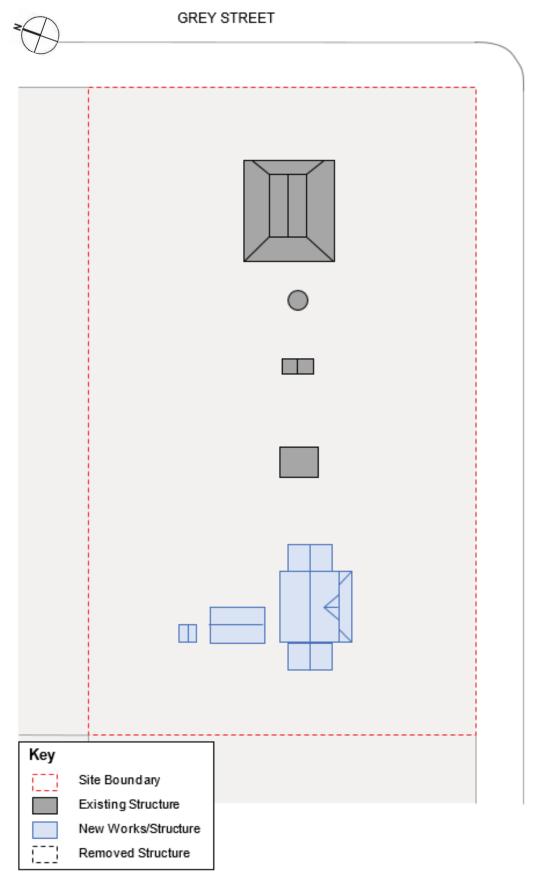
Clarence Town Courthouse and site period of construction - 1879
